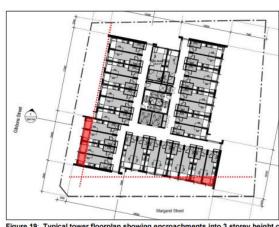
Typical tower floorplan showing encroachments into 3 storey height control area (Base Image source: AJ+C Architects)
